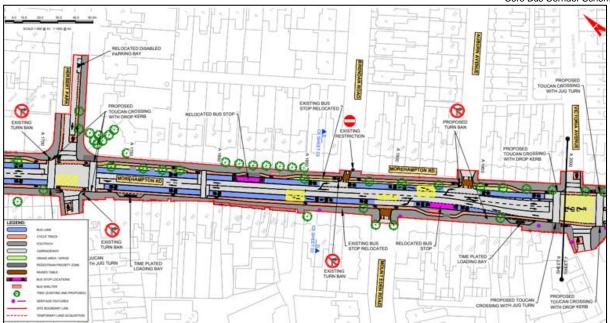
Extract from General Arrangement Drawings at Brendan Road (Sheet 06)
